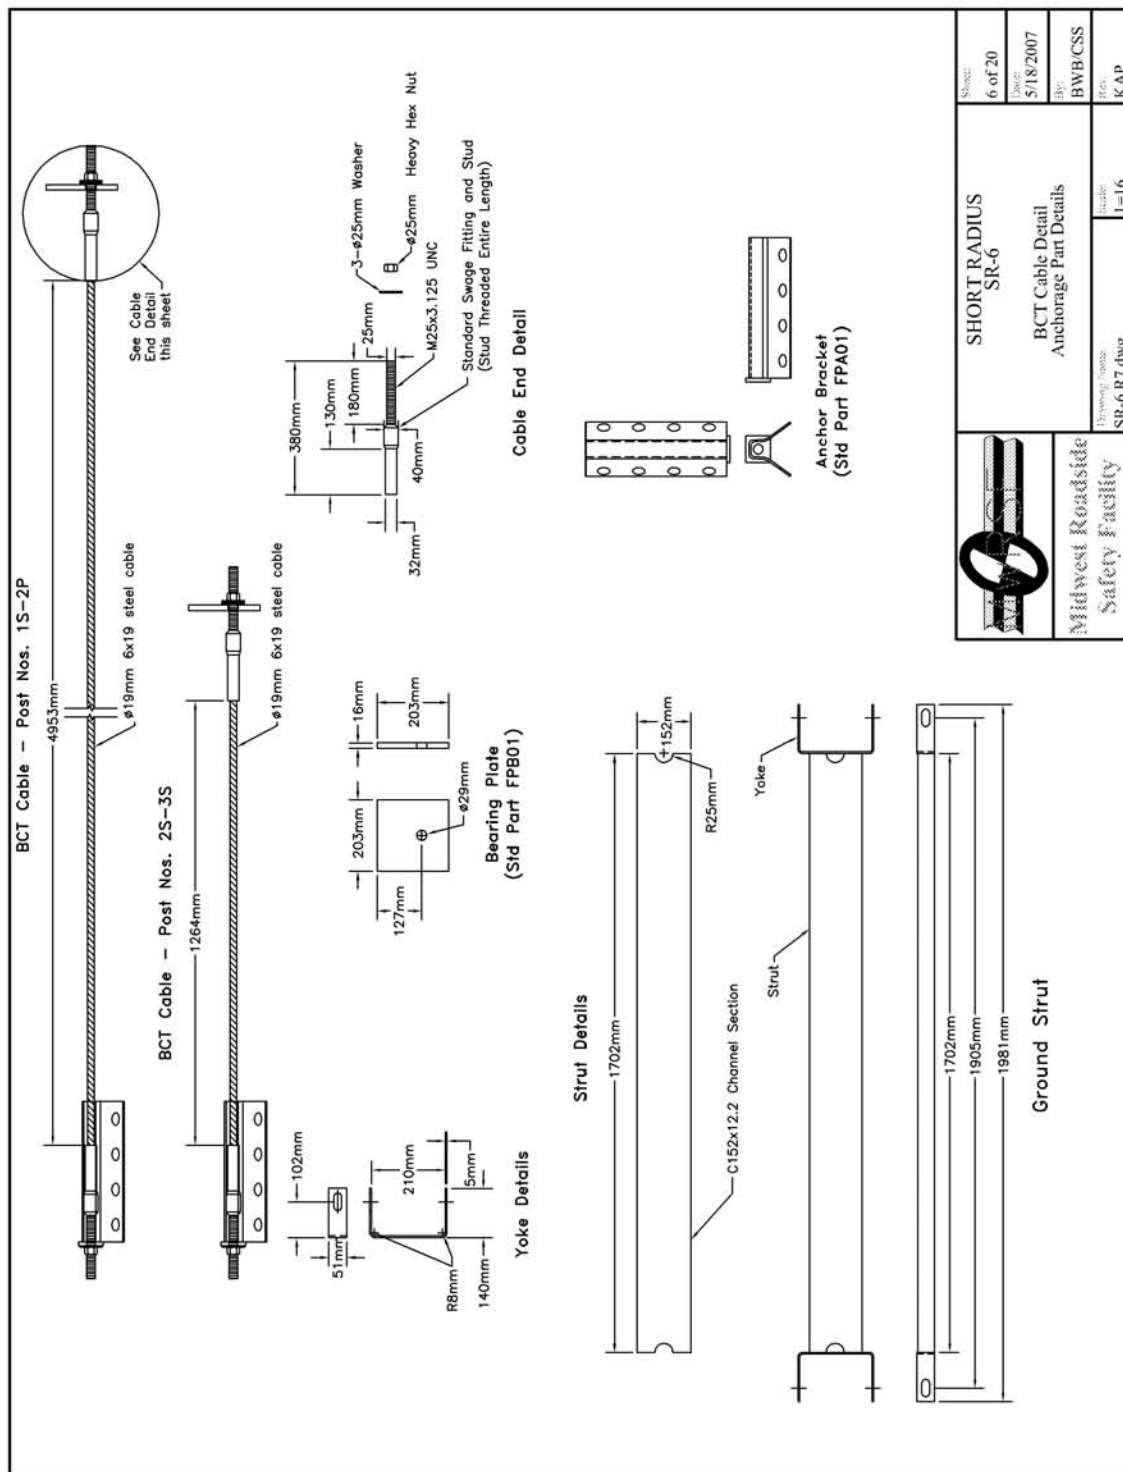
BCT Cable and Anchorage Part Details, Test SR-6
